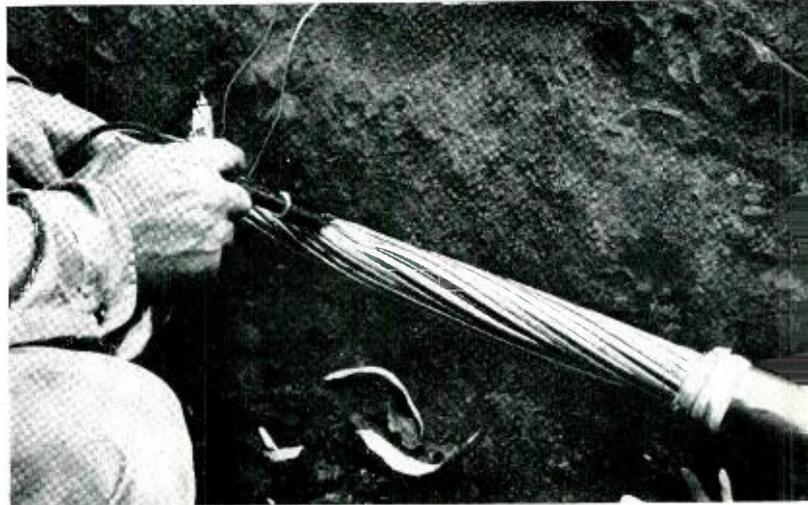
Part of a damaged coaxial cable with sheath removed.
